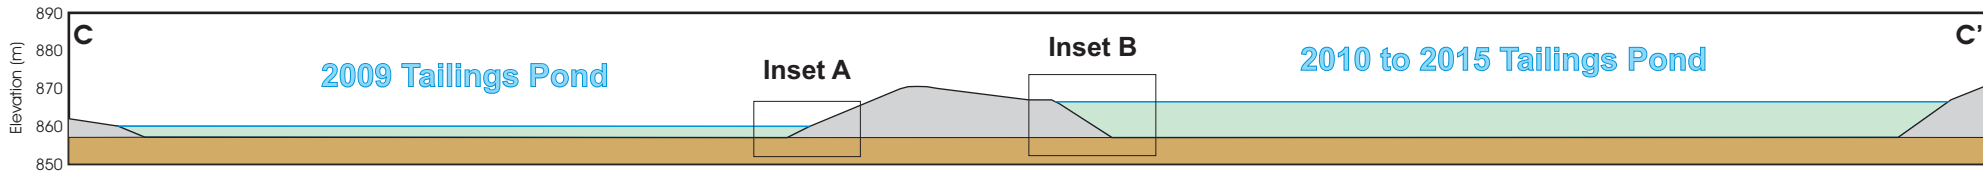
2009 to 2015 Tailings Facilities (Section C)
